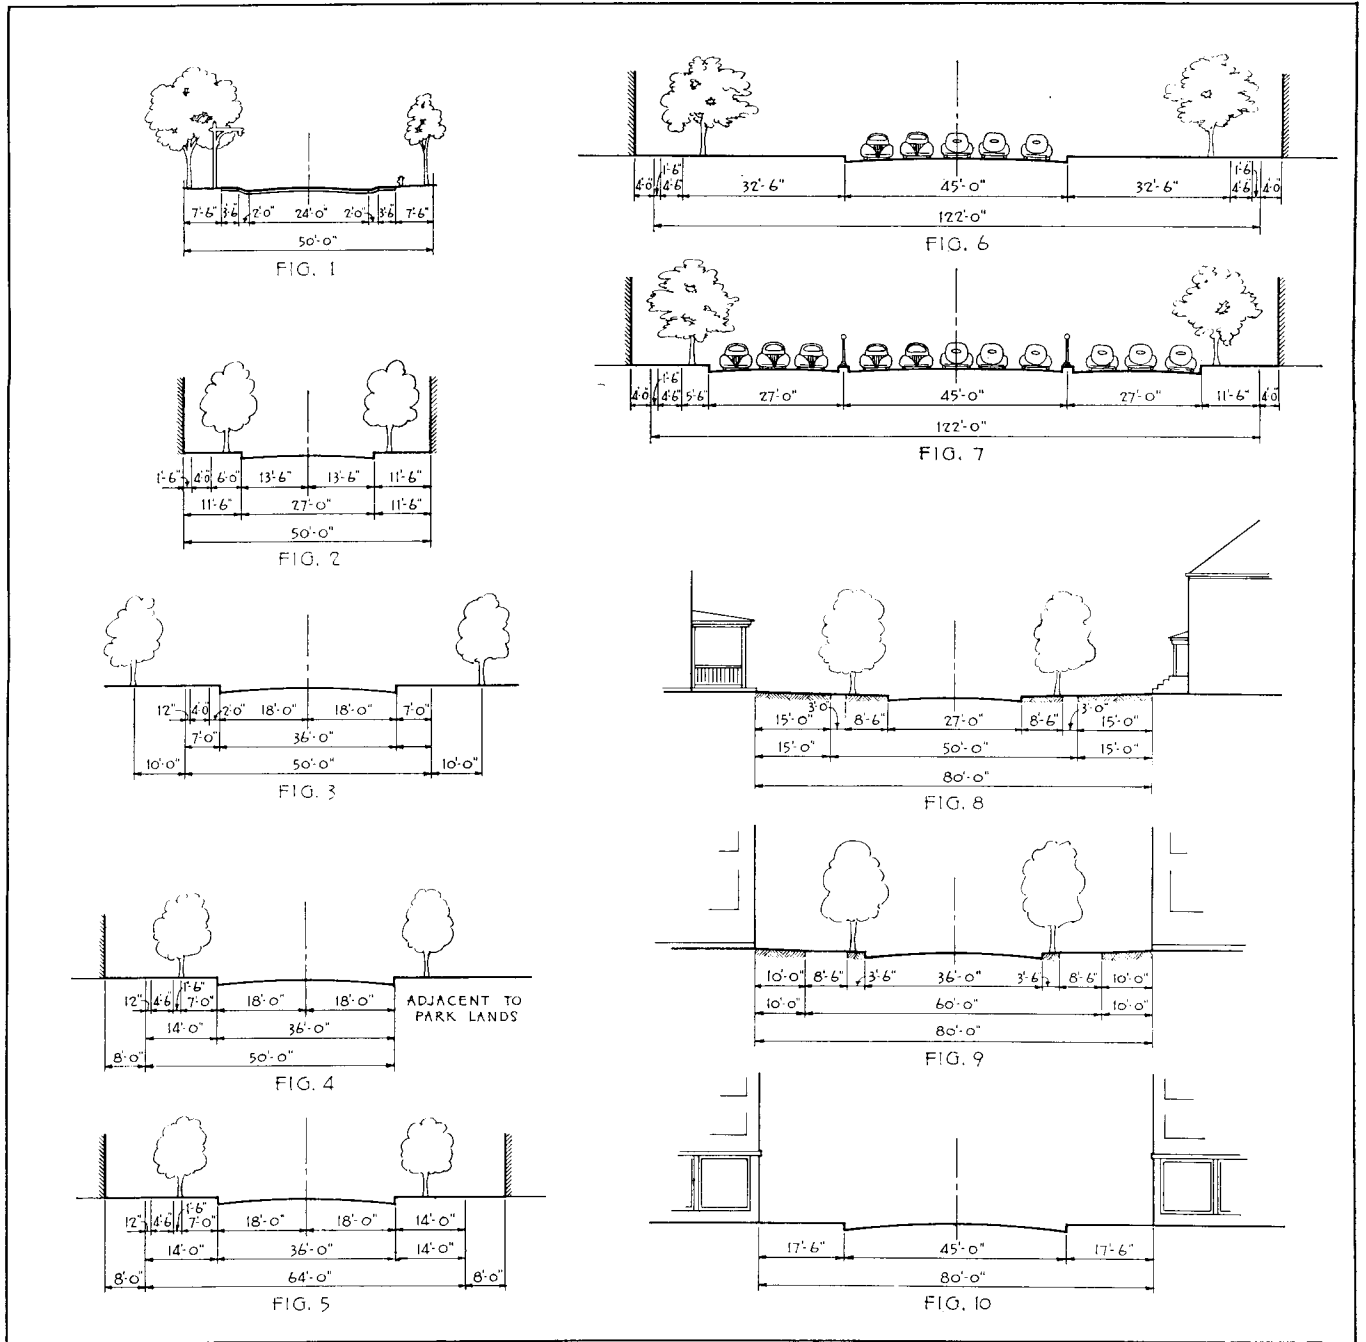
Typical roadway cross section for minor residential streets in low-cost neighborhoods. Section by Land Planning Division, Zone II, Federal Housing Administration.
